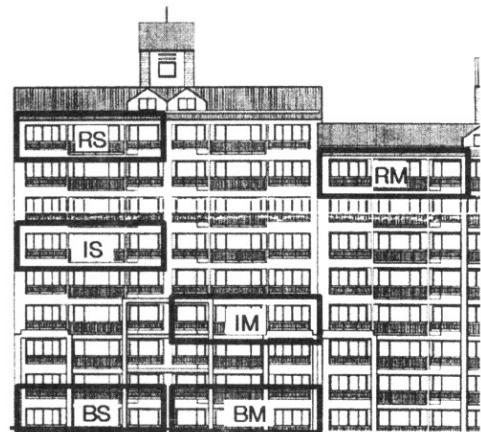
Locations and their identifications for house models (R: Roof, B: Bottom, I: Intermediate, M: Middle, S: Side).
